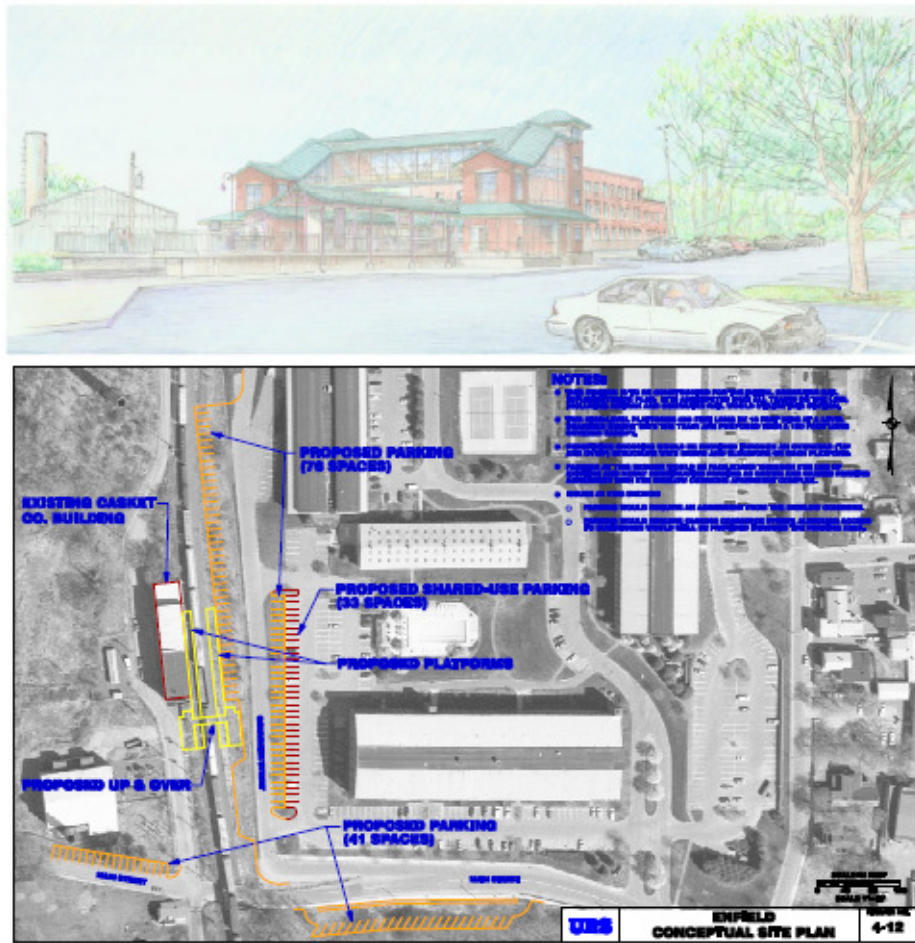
Conceptual Rendering and Site Plan for the Enfield Rail Station
